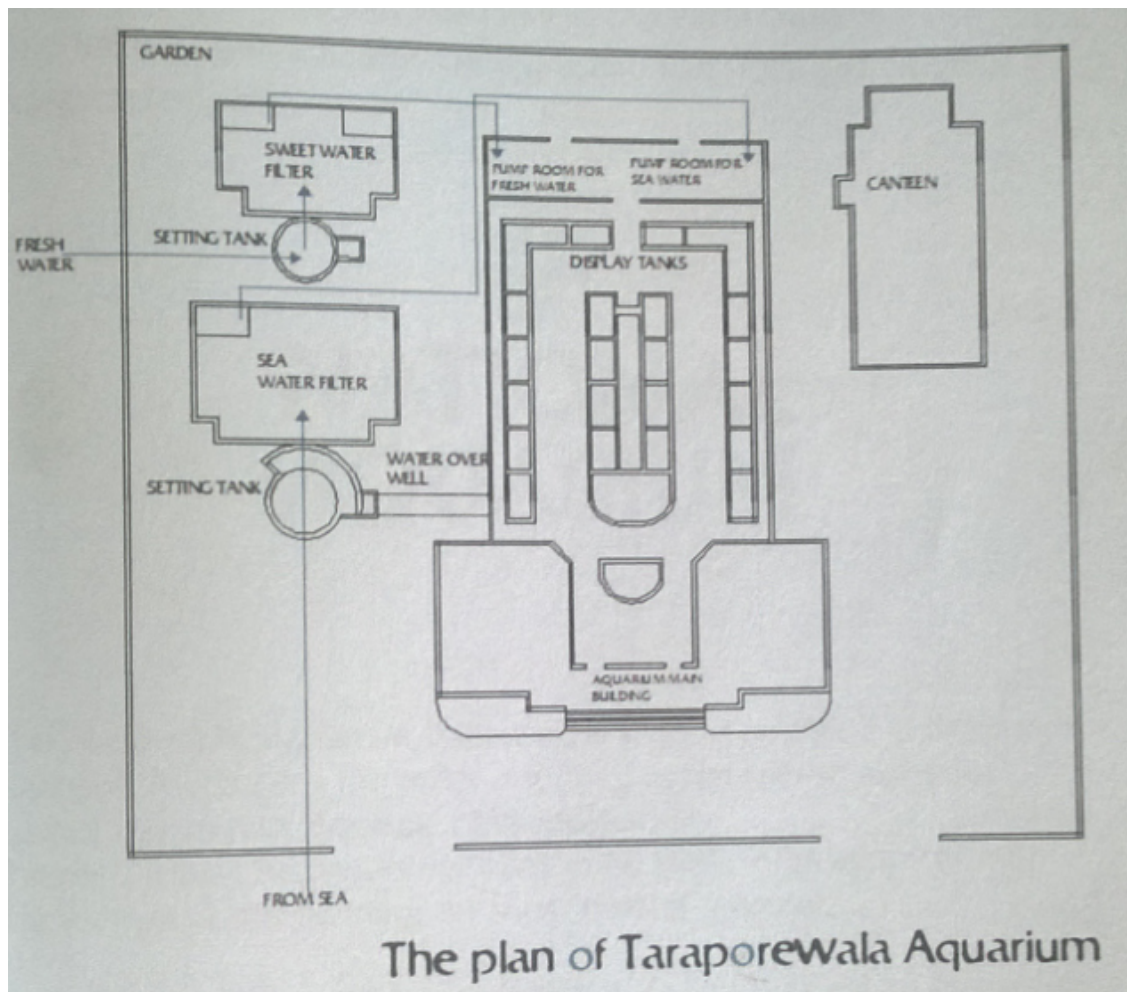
Ground Floor Plan Of Taraporewala Aquarium
